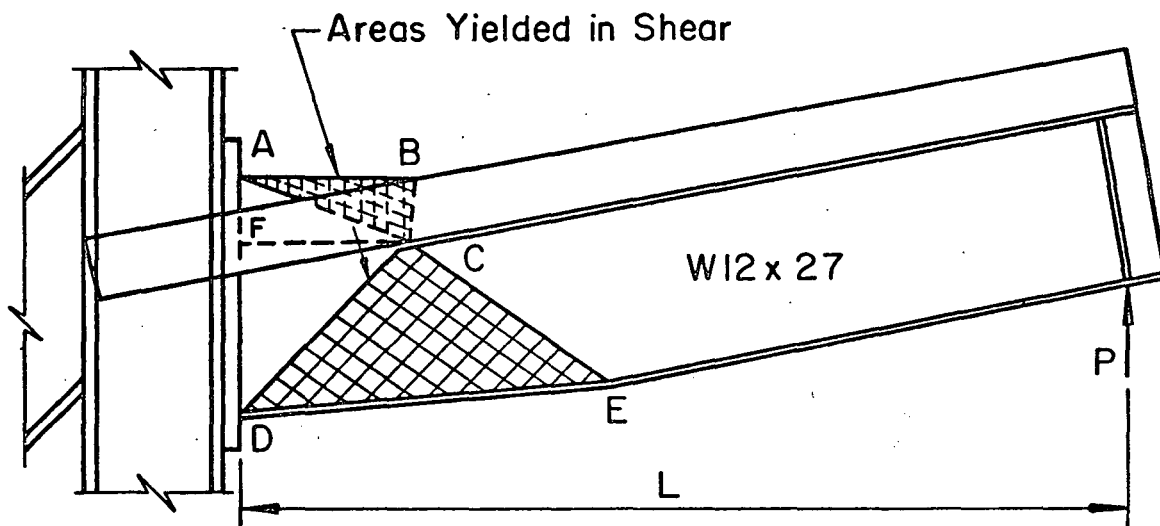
ASSUMED FAILURE MECHANISM FOR CONNECTIONS WITHOUT TRANSVERSE SUPPORT
